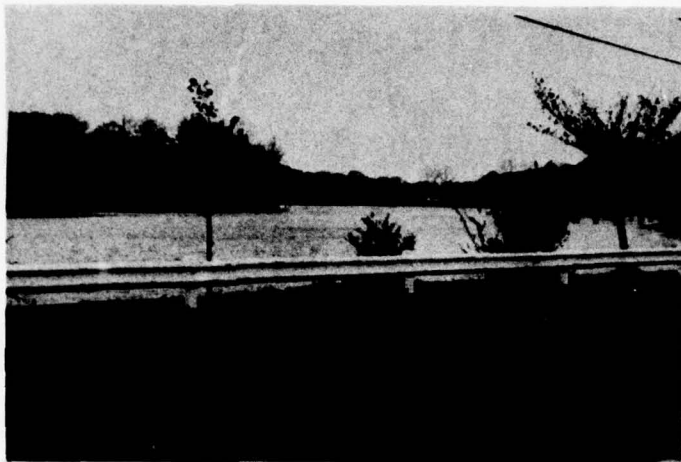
View of Lake Lefferts, looking upstream from the roadway embankment
